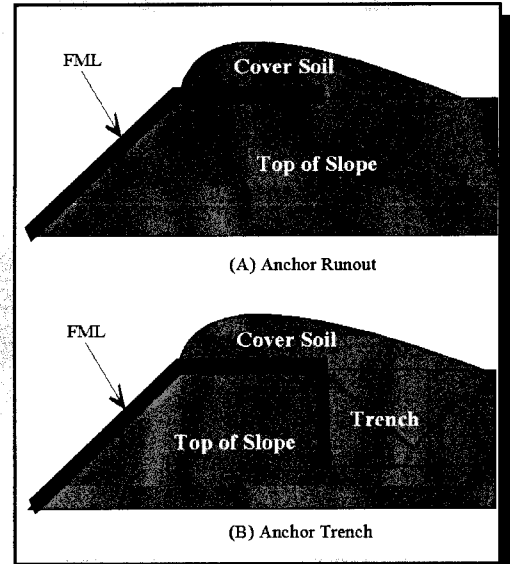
Example detail of (A) anchor runout and (B) anchor trench. Anchor trenches can also be "V" shaped (dashed line).
